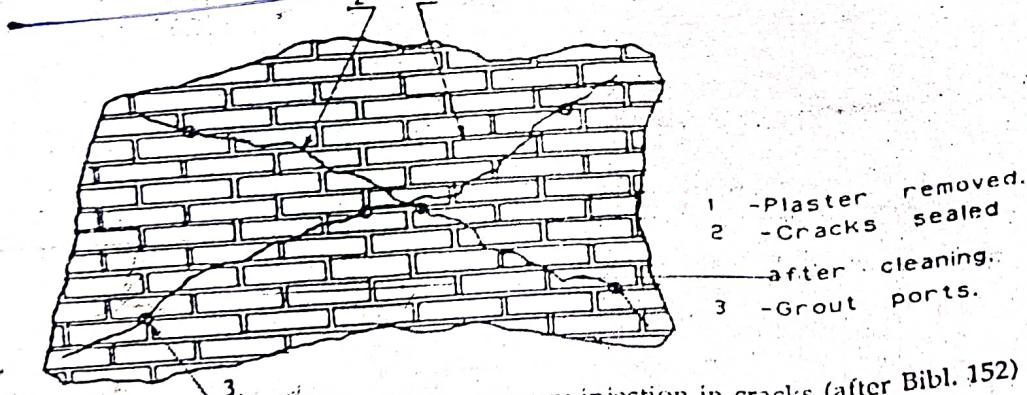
Grout or epoxy injection in cracks (after Bibl. 152)
